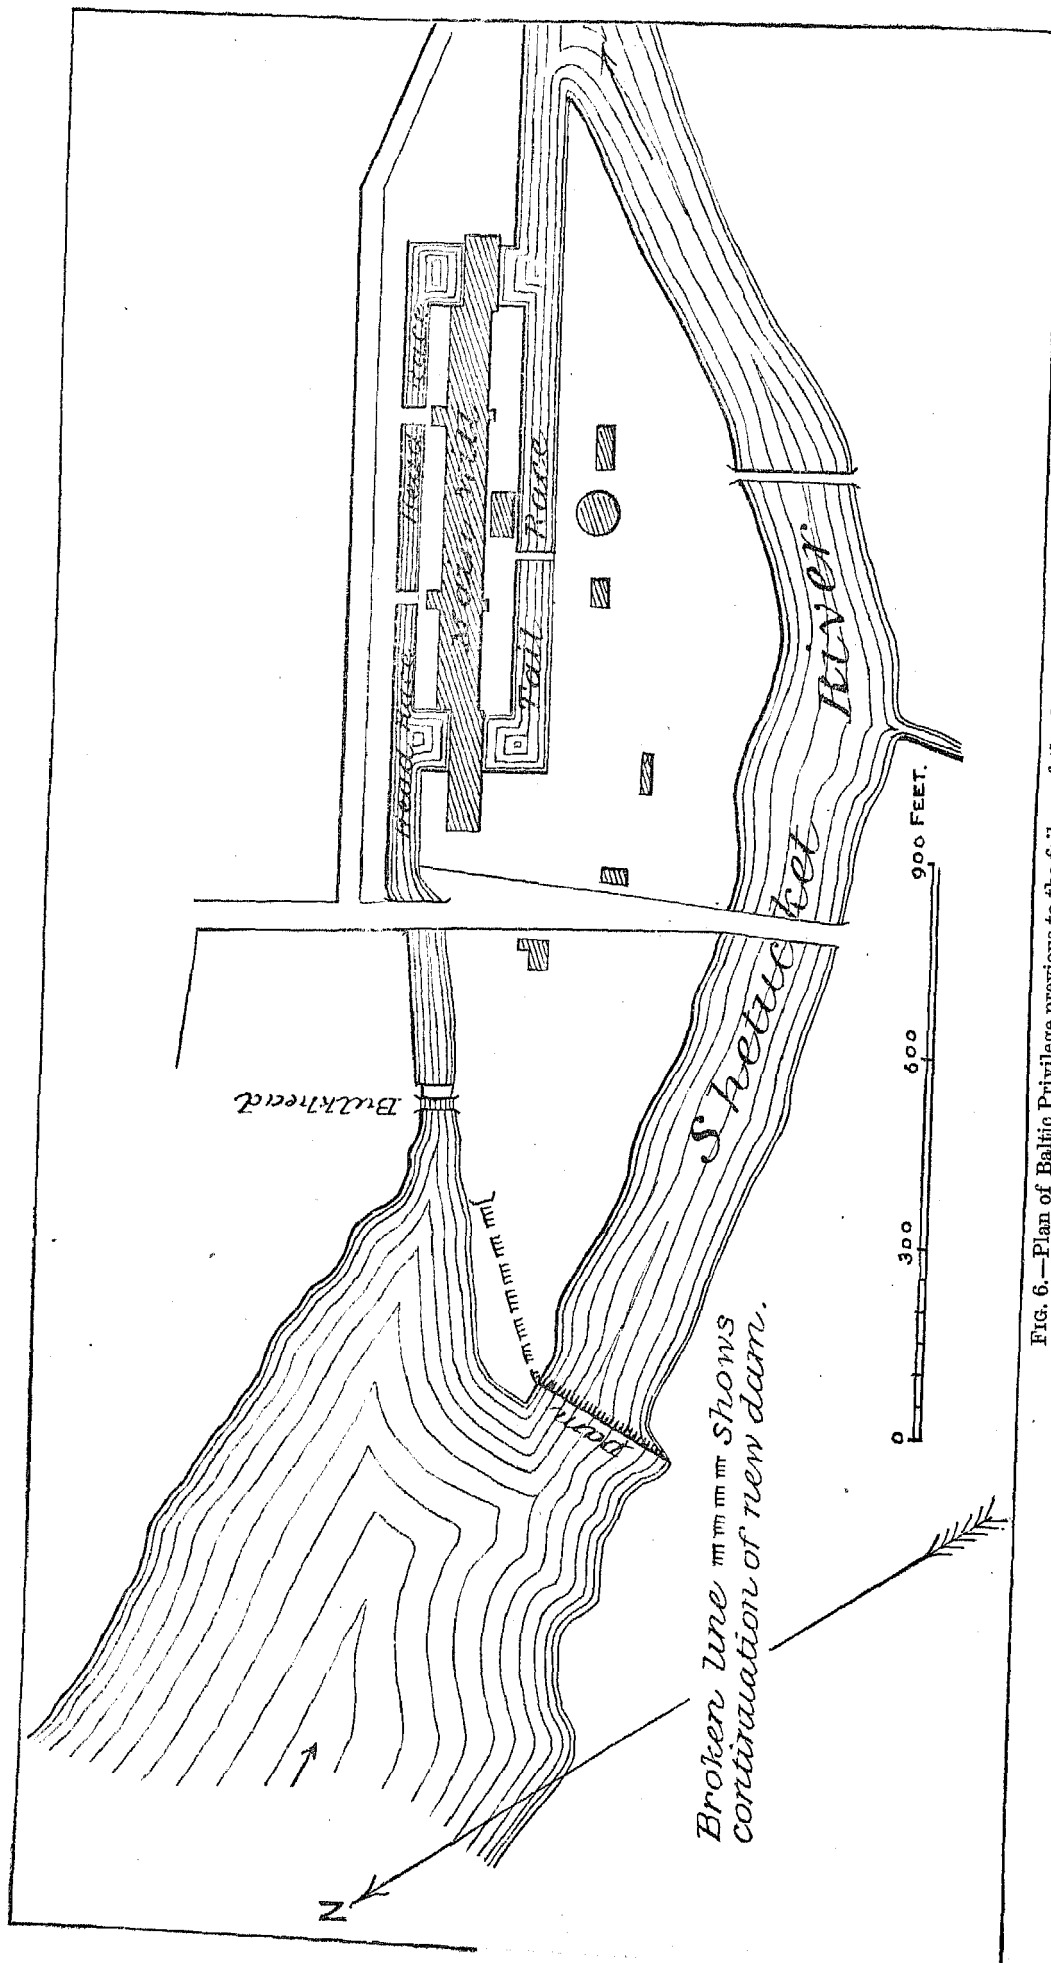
Plan of Baltic Privilege previous to the failure of the dam.
